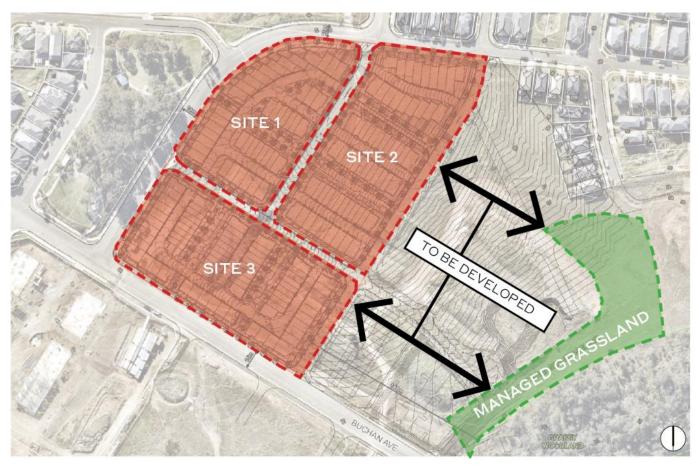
Off-Site Asset Protection Zone (Managed Grassland, East)
